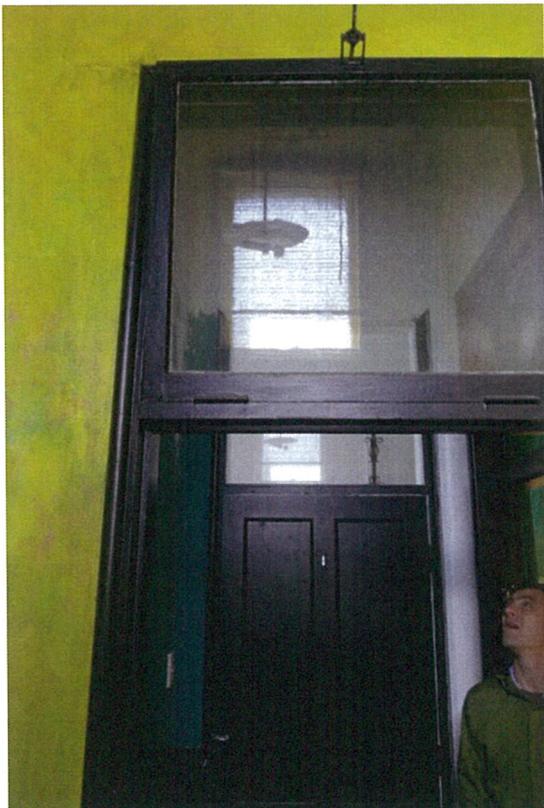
Small crack in the top left corner of door frame, bathroom.
